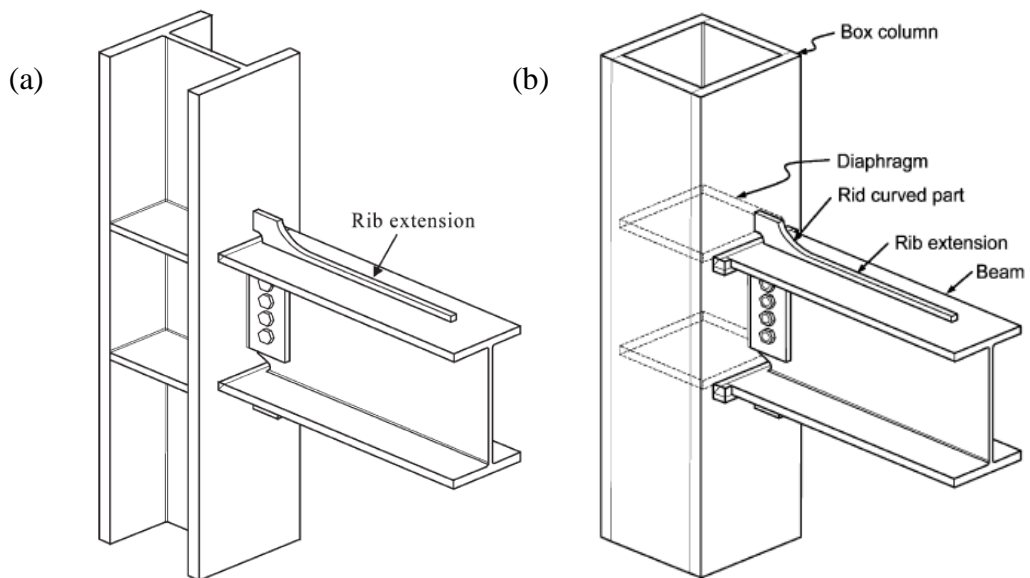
Lengthened flange rib strengthened connection: (a) With I-shape column (Chen, 2003a & 2003b); (b) With welded box-shape column (Chen et al., 2004)
